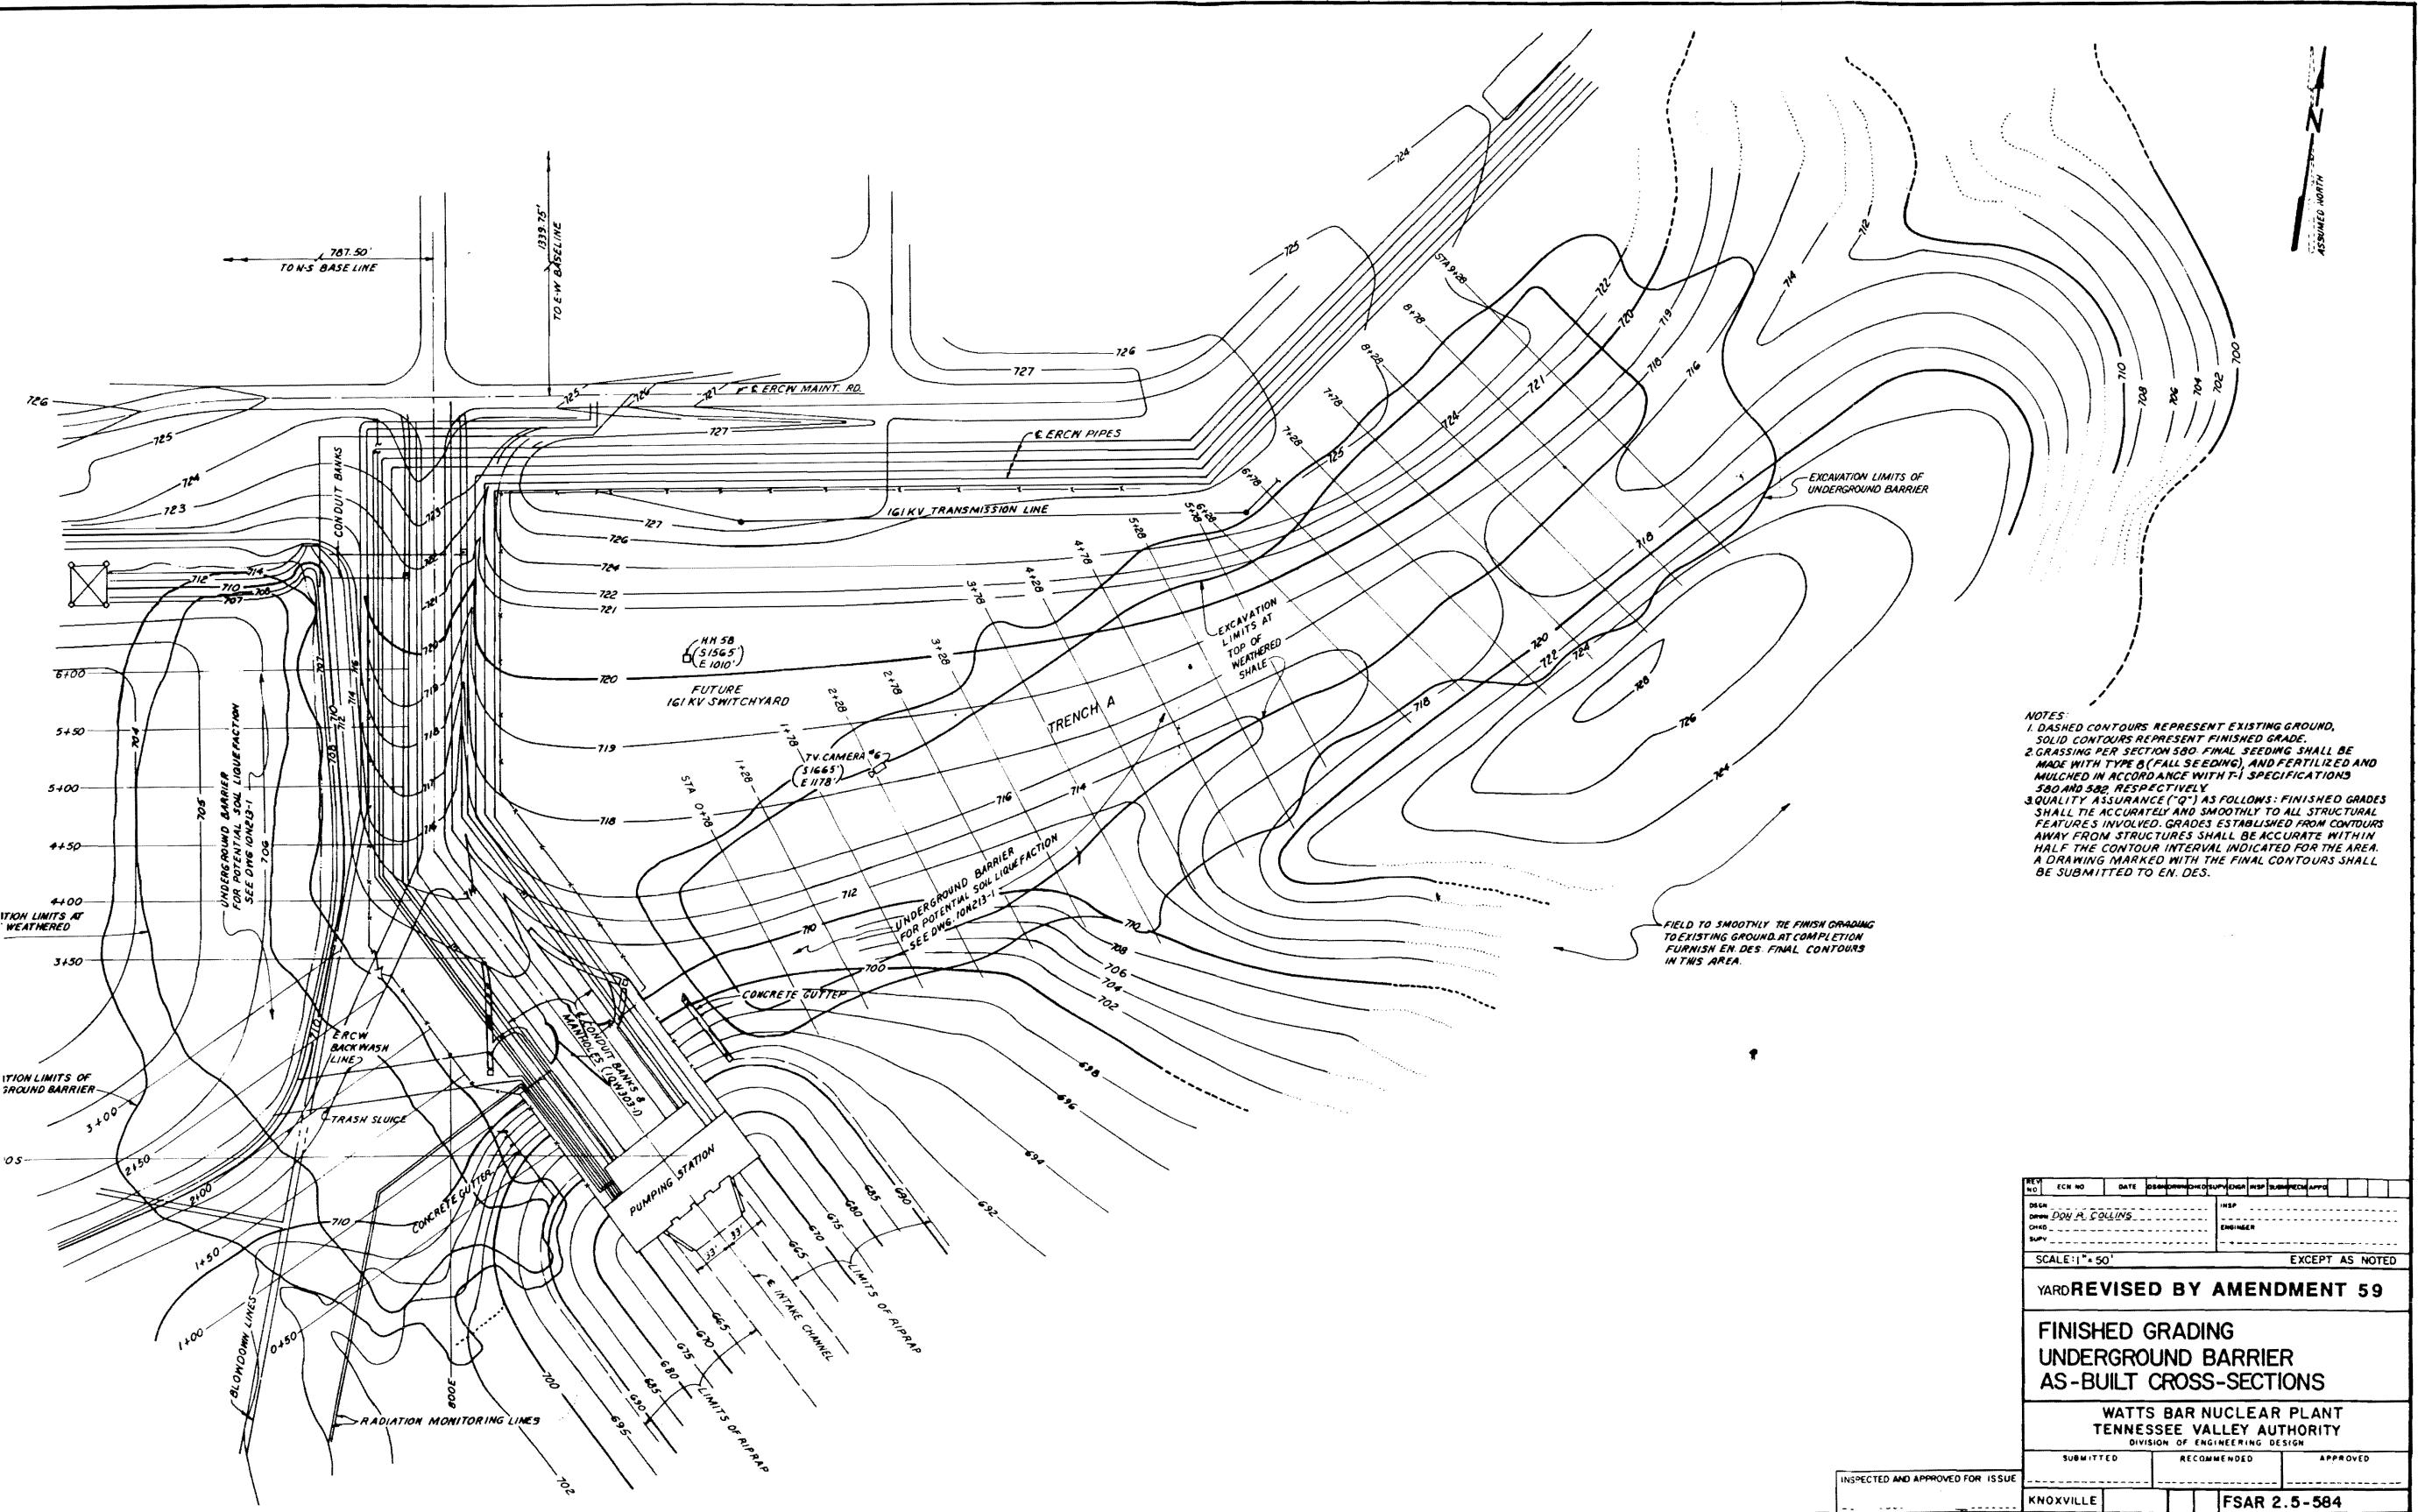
Finished Grading - Underground Barrier As-Built Cross-Sections
